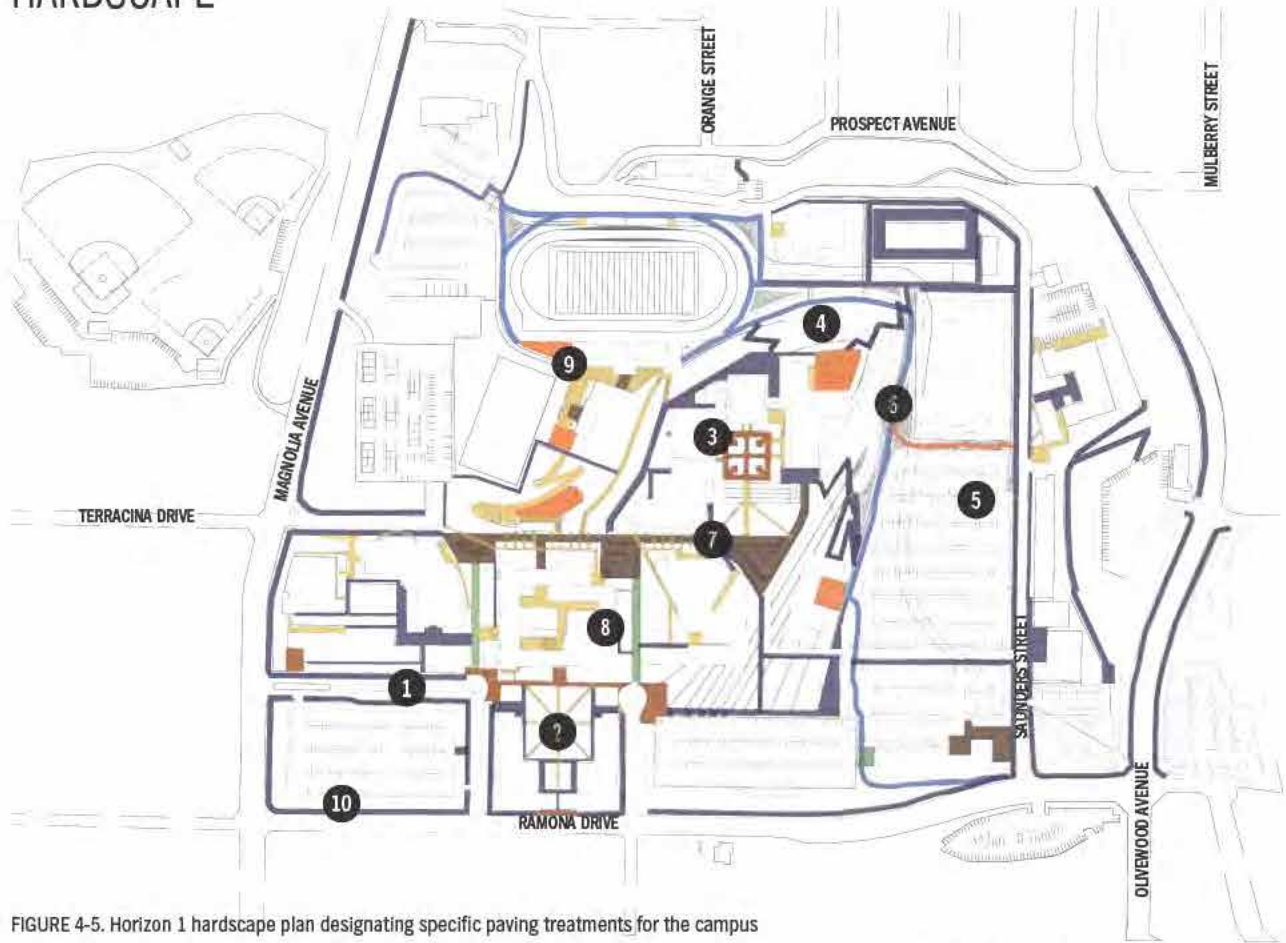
Horizon 1 hardscape plan designating specific paving treatments for the campus
